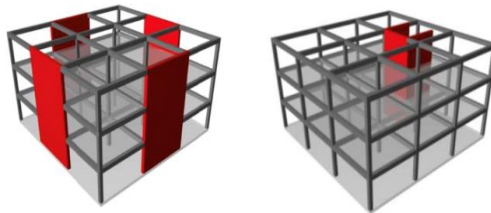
Examples of Global interventions: On the left, new construction of a seismically resistant structure. On the right, the reinforcement of existing RC walls. From [67].
